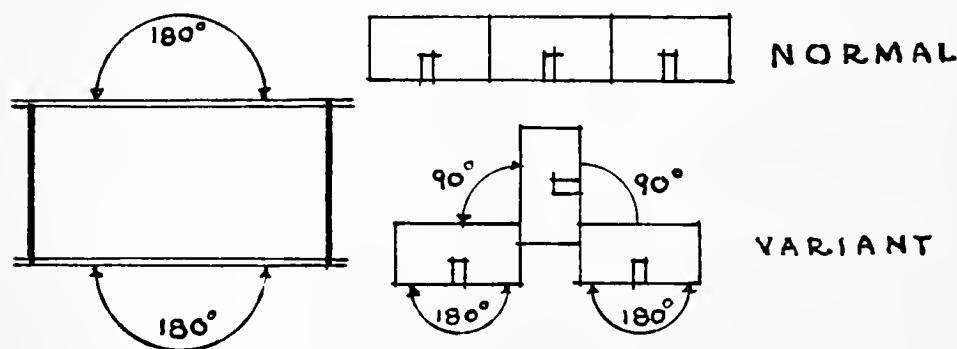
Assembly of strip units at two ends with 180° vision and no blind space (left). Normal assembly and variant assembly of strip units (right).
